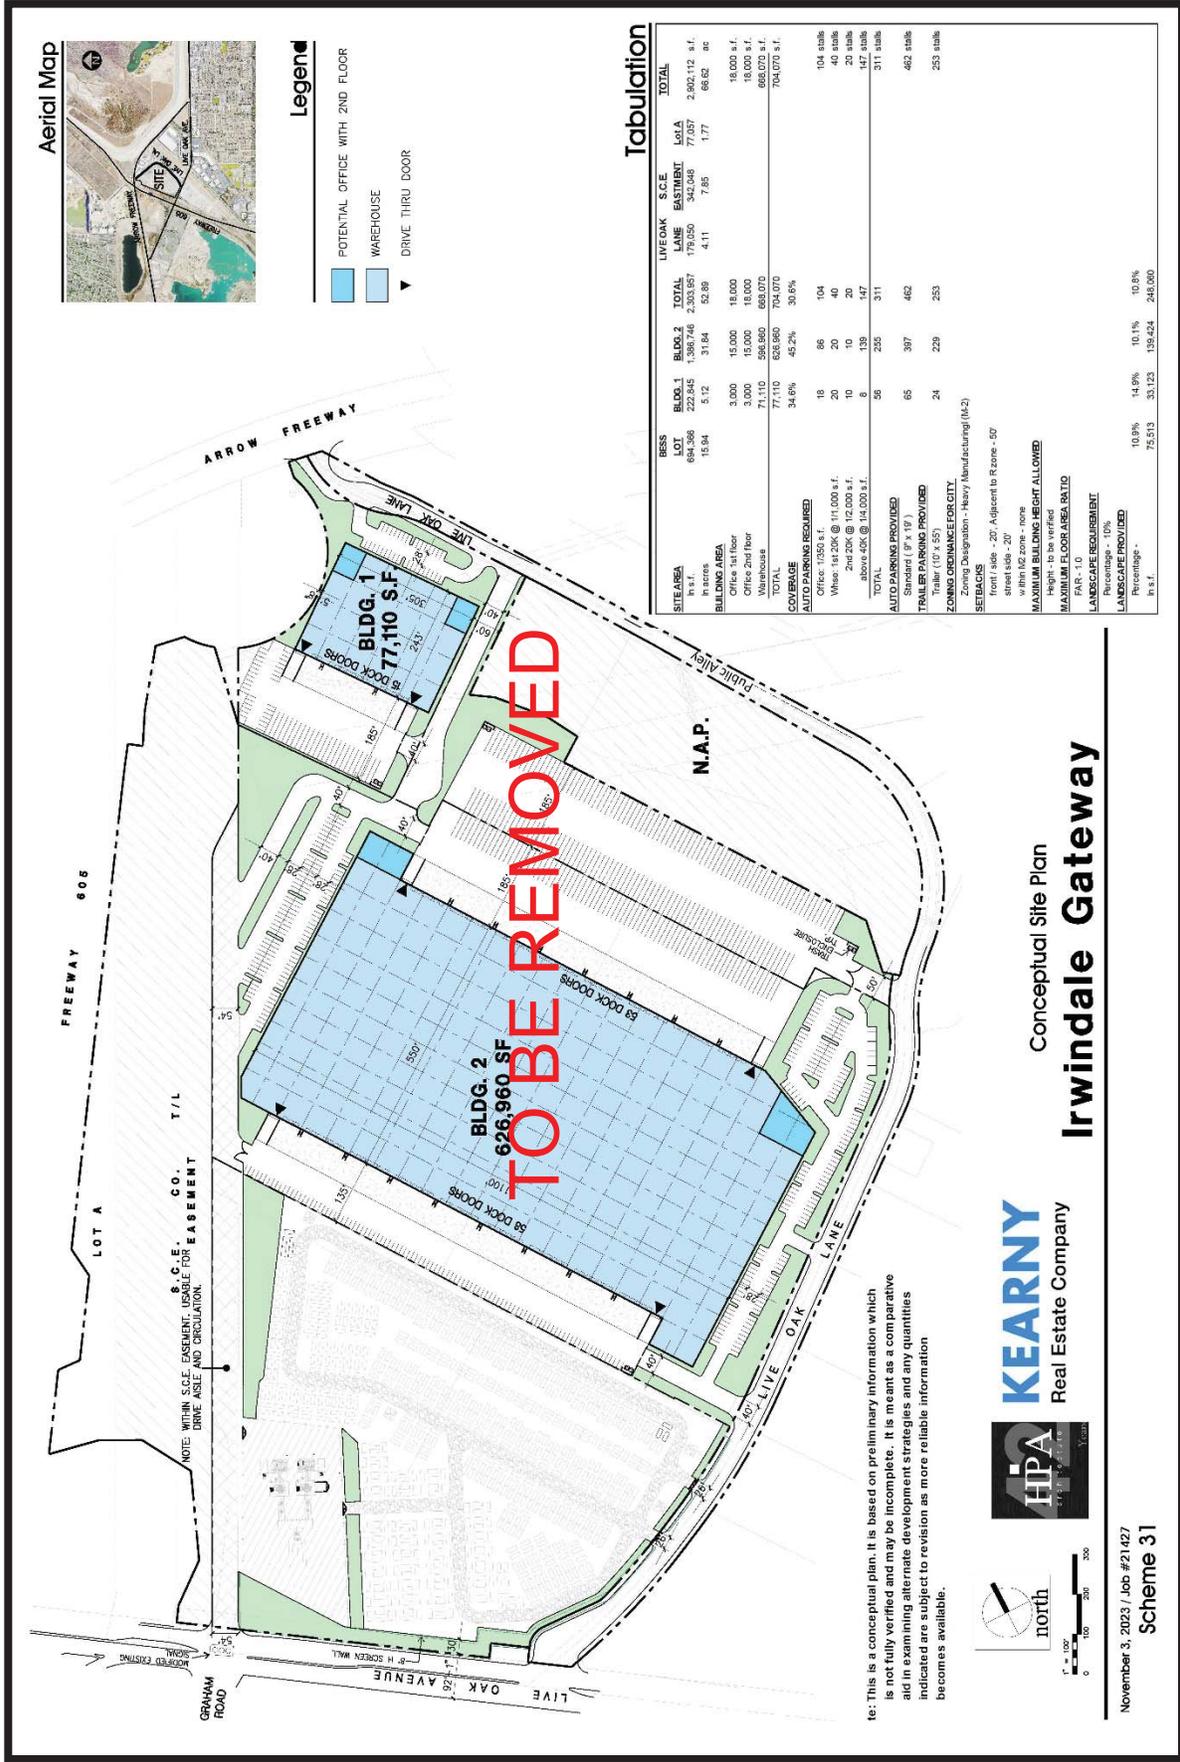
CONCEPTUAL SITE PLAN WITH BESS
